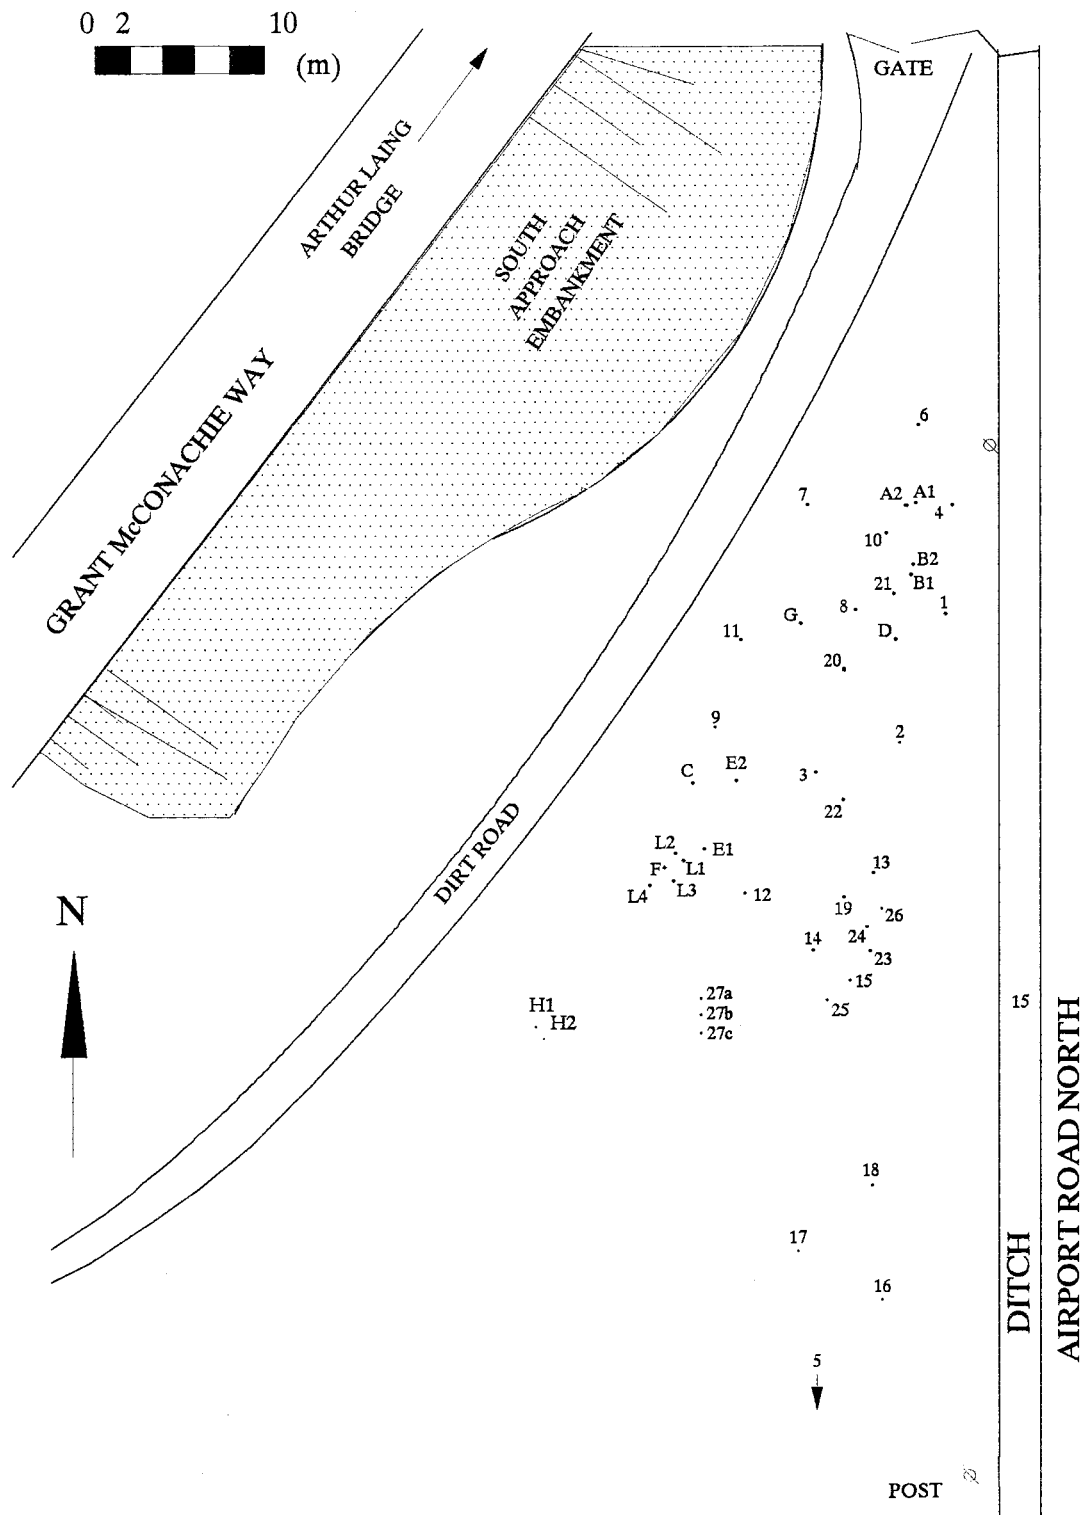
Location of In Situ Tests at Laing Bridge Site
